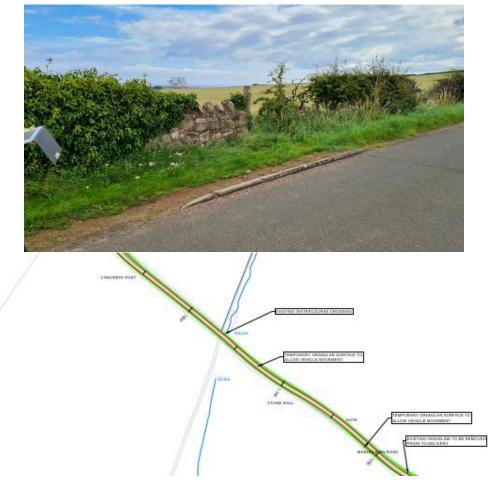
Culvert Road Crossing for Deliver to Substation 8 & 9
